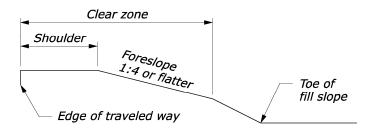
A TYPICAL RURAL CROSS SECTION ELEMENTS
